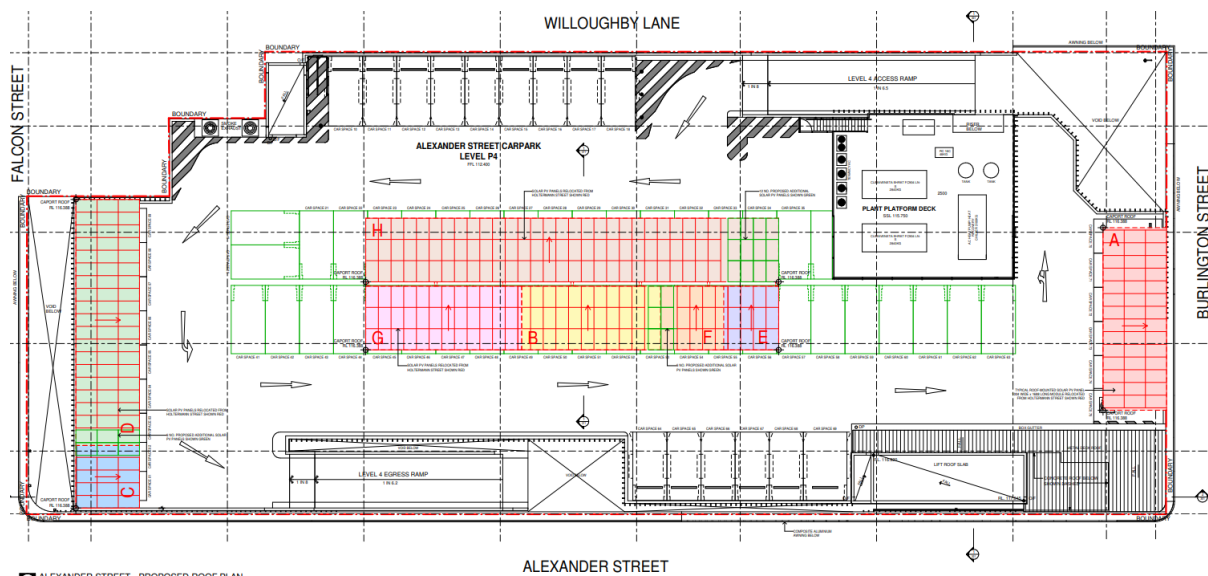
Alexander Street carpark, Level P4 indicating location of relocated and new solar panels on proposed carport roofs, shown coloured (excerpt of plan 103, NBR Architecture)
